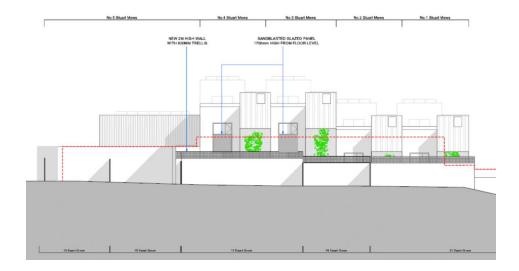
Mews units/ rear elevation viewed from Ewart Grove properties
